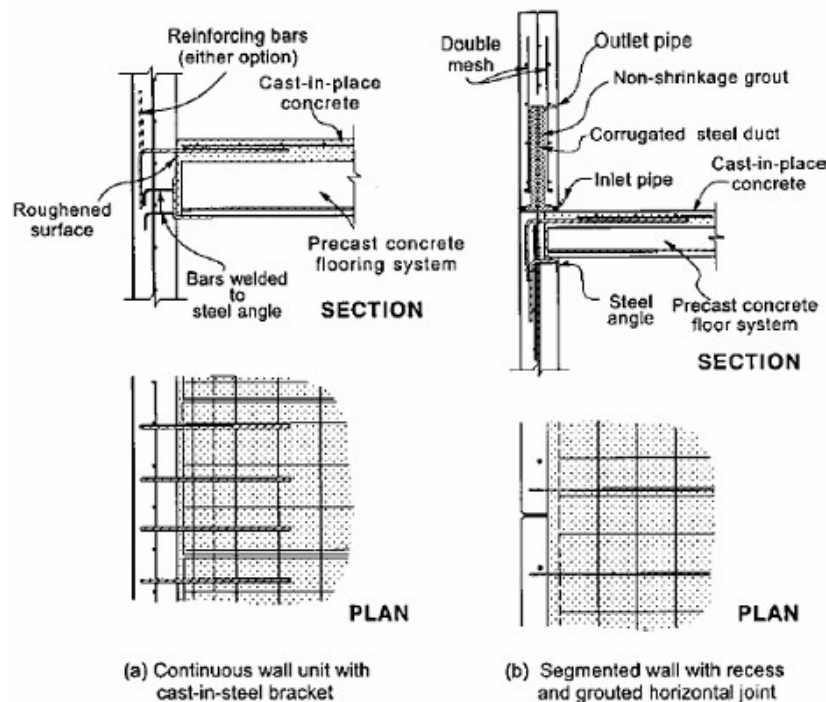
Examples of precast reinforced concrete exterior wall-to-precast floor connections
